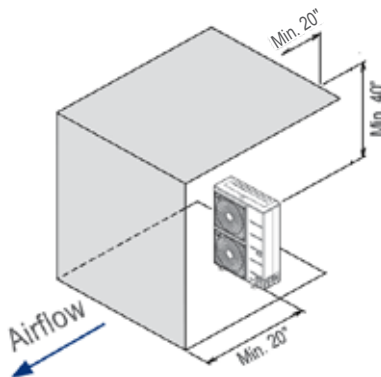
Single Unit—high rear wall and low front wall with no side walls
